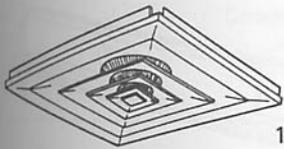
(b-2) Installation detail for diffuser mounting directly on a stub duct. Units can also be mounted on a damper, a splitter/damper, a radial deflector, an equalizing damper or a direction changer as required by the particular installation.
